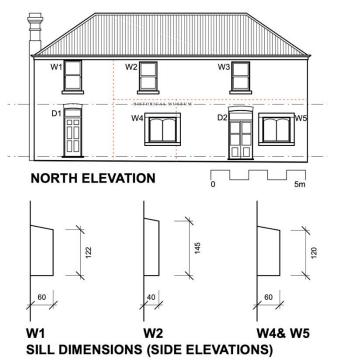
Dimensions of rendered brick or stone (?) window sills on north elevation, supporting our understanding that the two shopfront windows are contemporary with the Phase 4 (1880s) addition.
